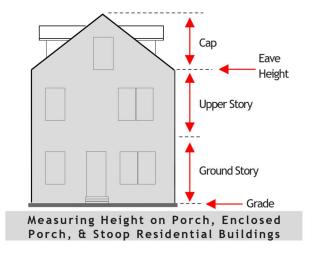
E(4): Measuring Height on Porch, Enclosed Porch & Stoop Residential Buildings
